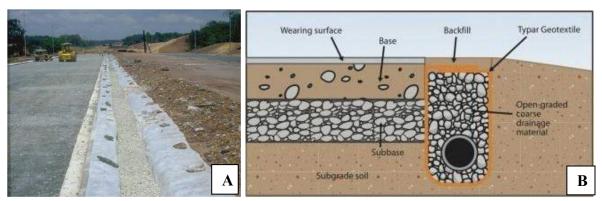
Filter drain along A-road B-Cross section (Panjami 2016)
